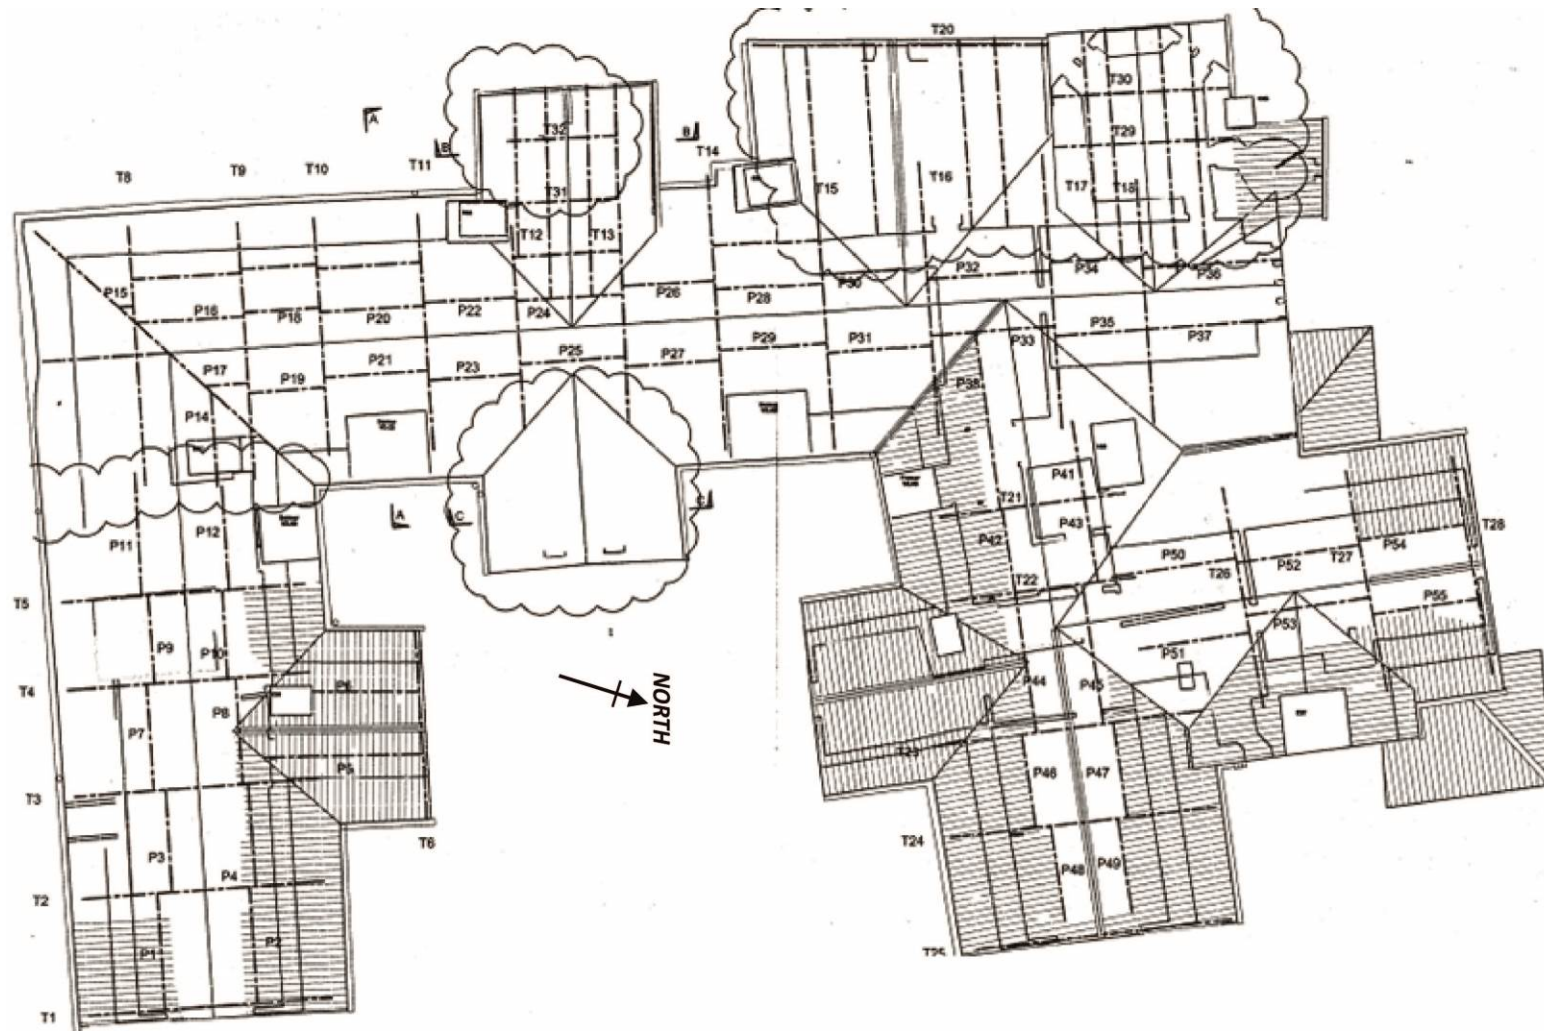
Plan at attic level (after Rodney Melville & Partners)
